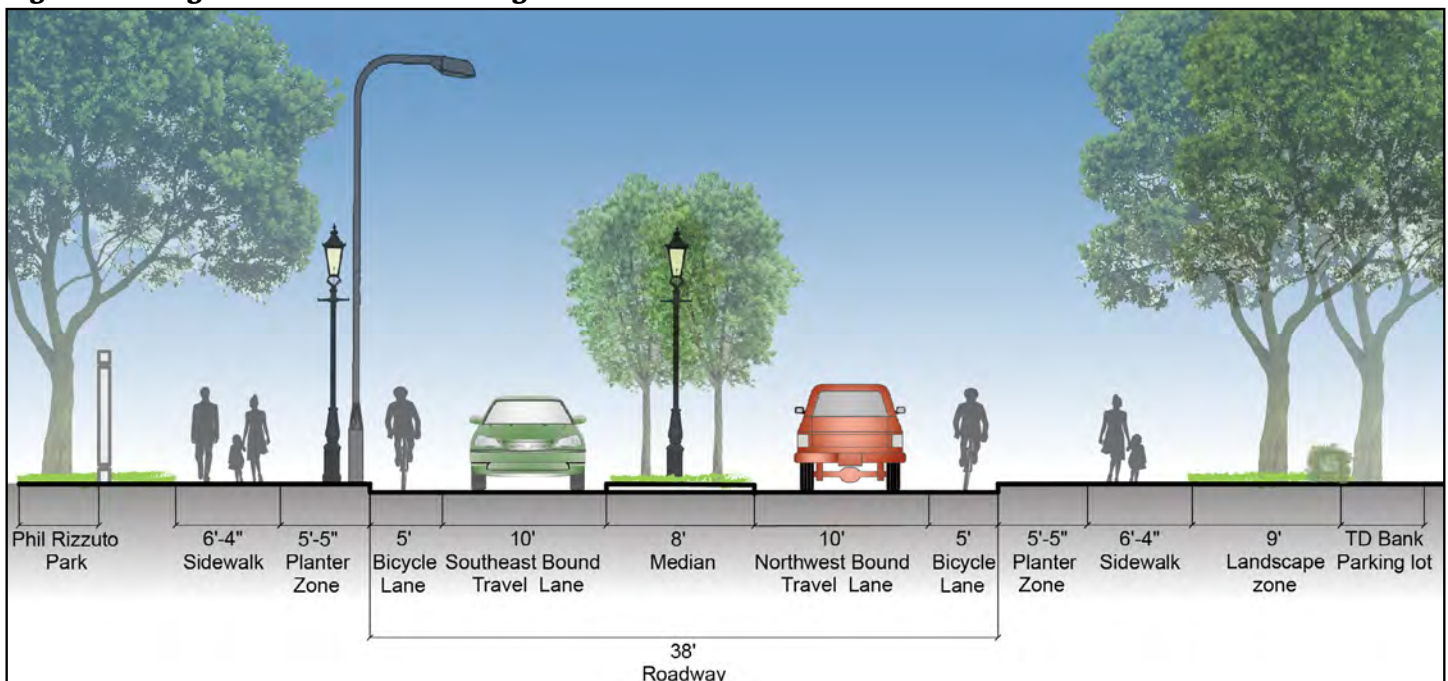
Design Alternative #2 rendering of Morris Avenue between Trotters Lane and North Avenue.
